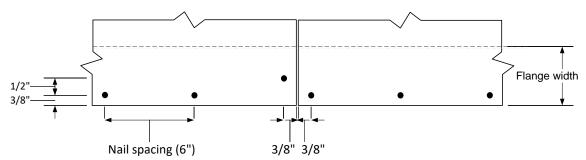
Boundary nails for nail spacing of 6 inches o.c. (not to scale)
